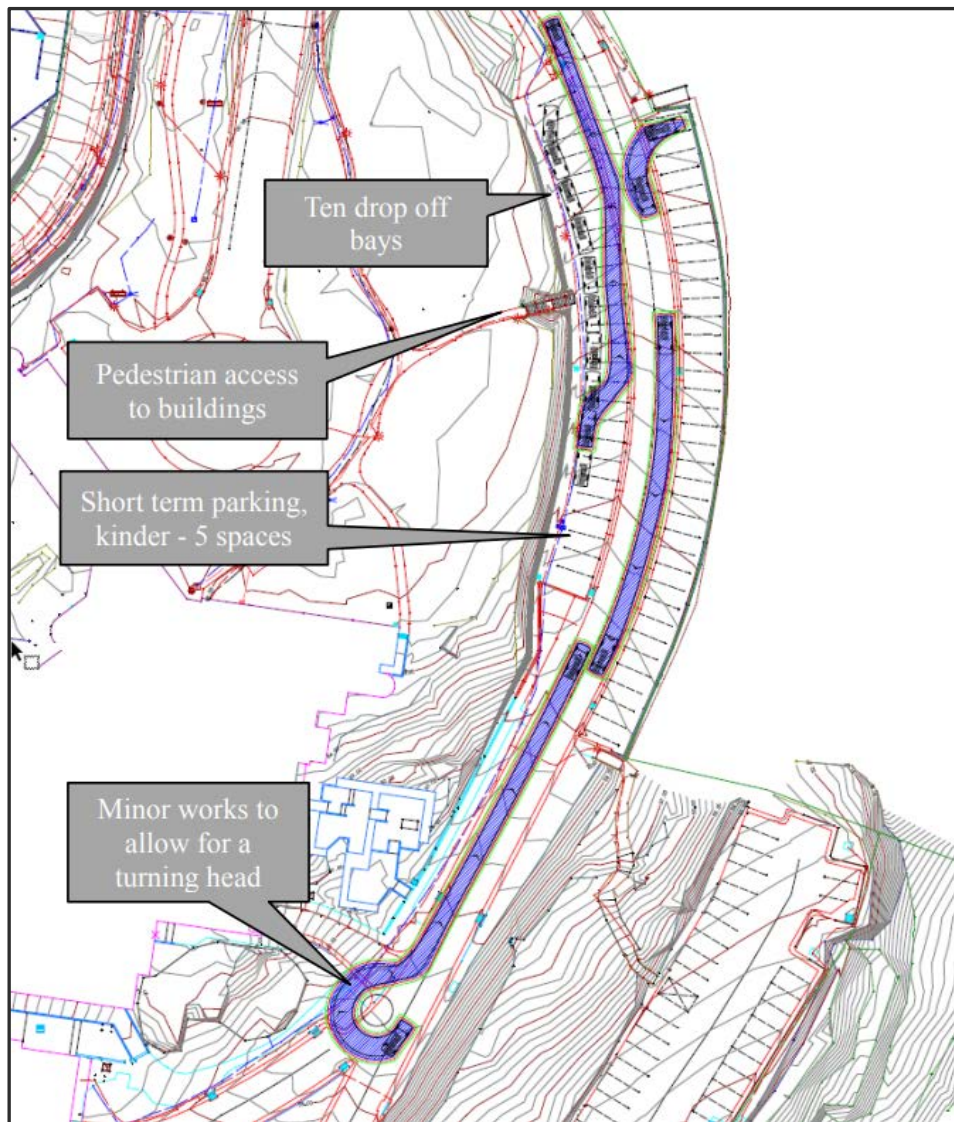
| Drop-off arrangement with a proposed turning head (Source: Applicant's RtS)
